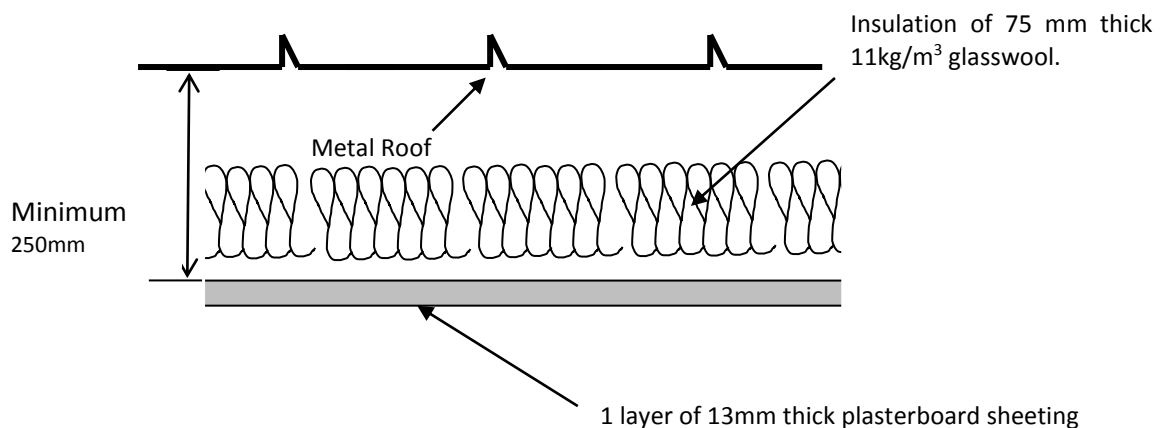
Roof / Ceiling Construction Below Light Weight Roof
